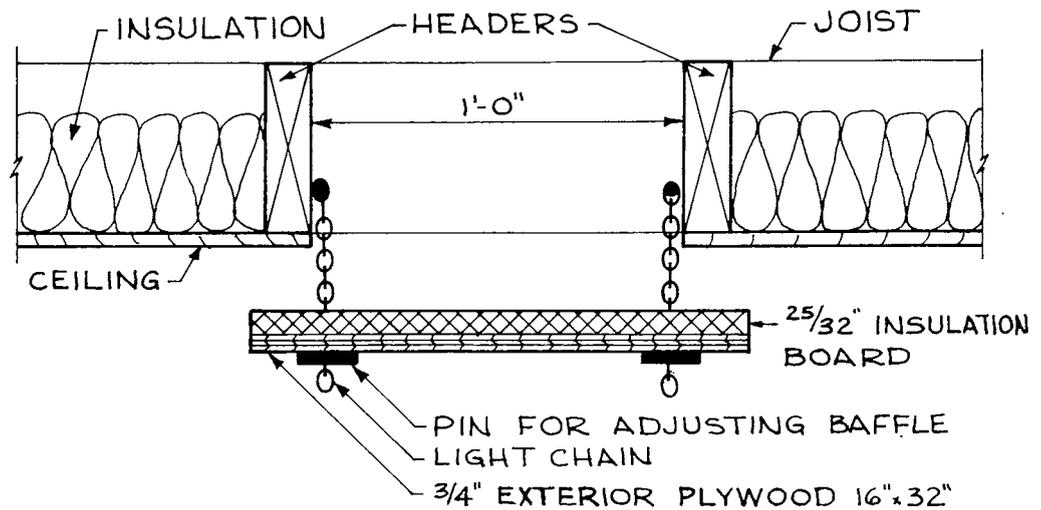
Detail of ceiling intake. The opening is 1 foot 0 inches wide between headers and 2 feet 0 inches long, which is joist spacing.
